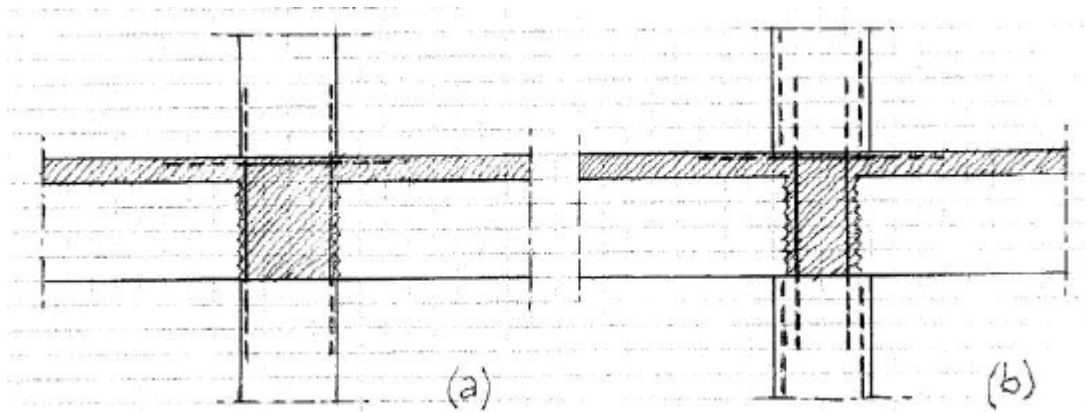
Recommended moment resisting connections presented in “Design Guidelines for Connections of Precast Structures under Seismic Action” publication of 2012, with partial cast-in-situ.
